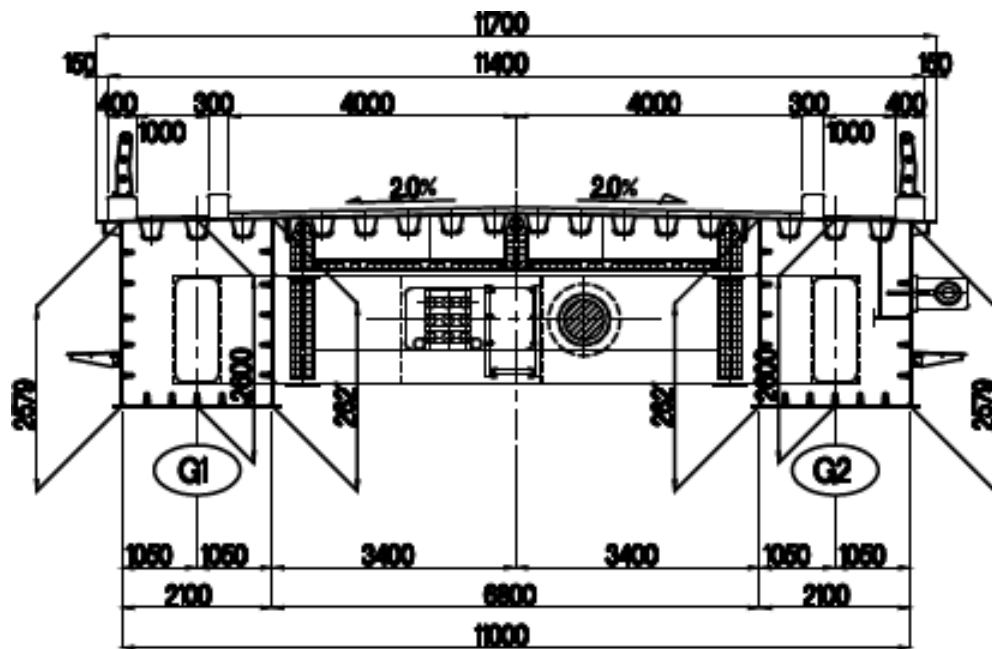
Girder Cross Section of the Diosdado Macapagal Bridge
